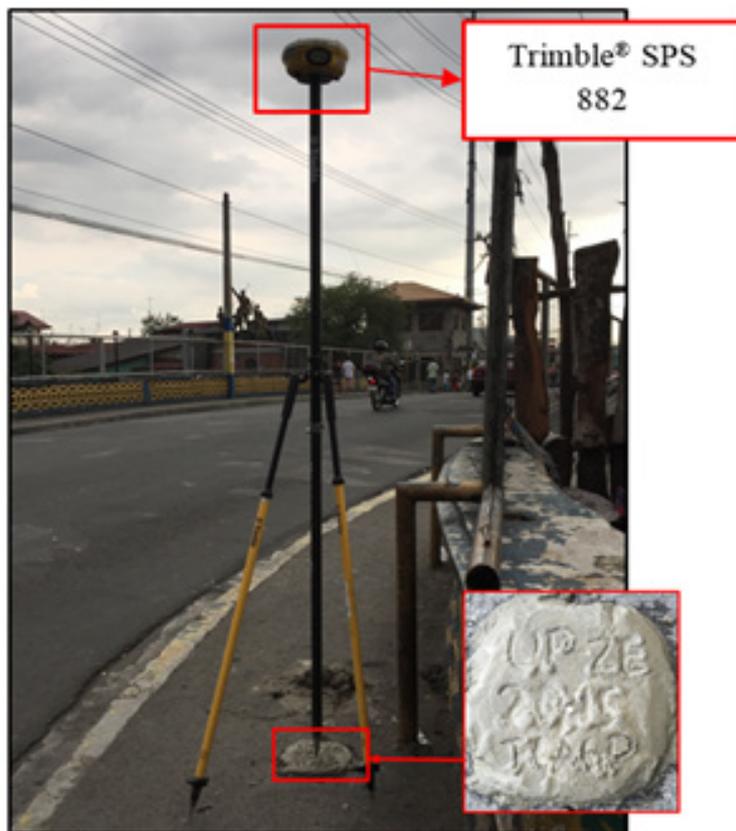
Trimble® SPS 882 set-up at UP-ZE, located at the Zapote Bridge in Barangay Zapote, Bacoor City, Cavite
